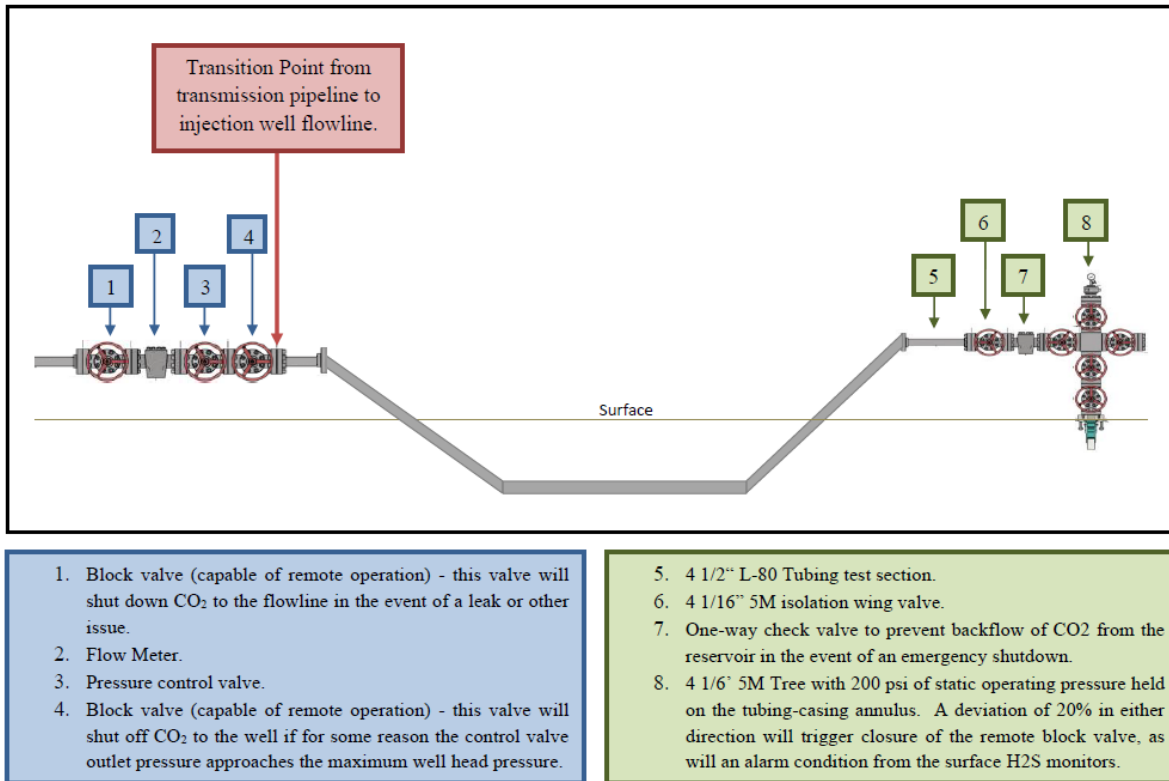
Diagram of surface connections at the Coteau 1 wellsite. The Coteau 2 through 5 wells will connect to a common gathering system at the Coteau 1 well pad. The Coteau 6 will be similarly equipped but will connect to a separate gathering system. The primary block valve (item 1 above) will be located at the Coteau 1 well while the rest of the equipment (Items 2 through 8 above) will be located on the well pads of each of the injection wells.
